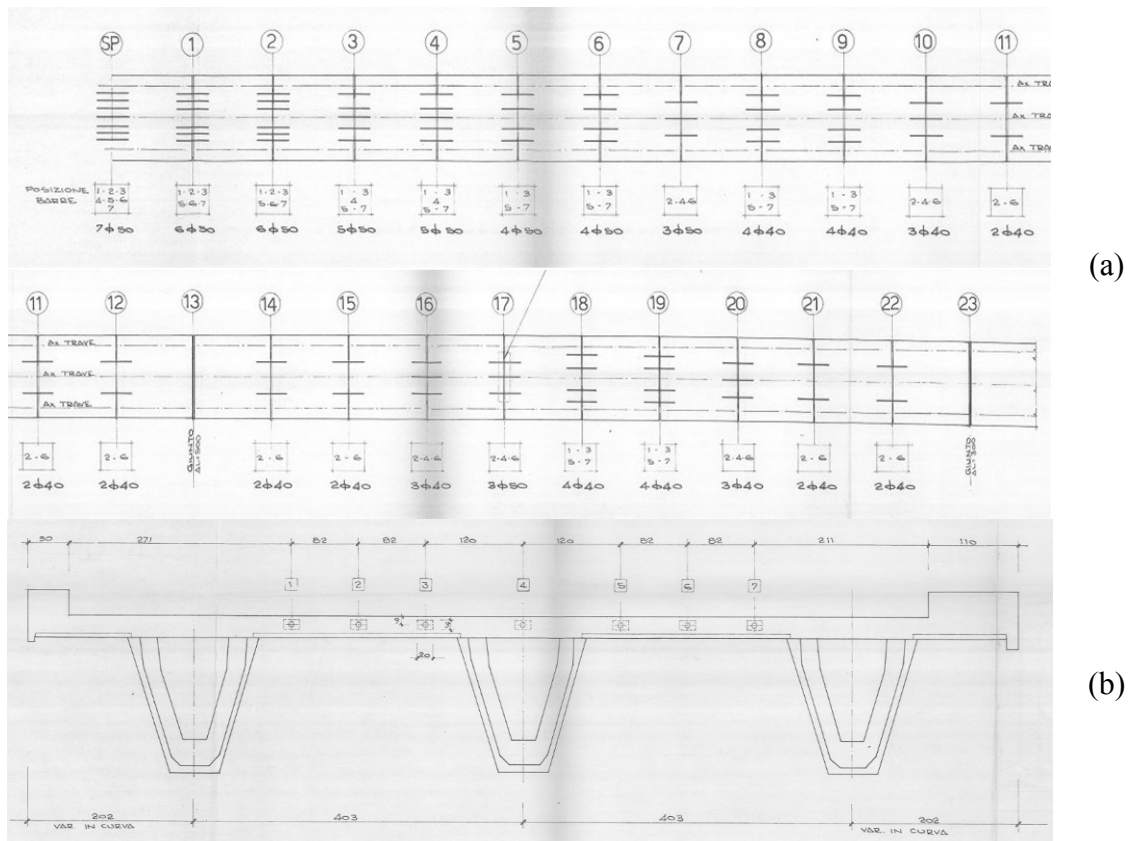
(a) Location of link bars from abutment A to pier 23; (b) pre-stressed concrete deck cross-section. Source: design project of the road links among SS76 road, A14 highway, Falconara airport and SS16 road, ANAS, 18.02.1986.
